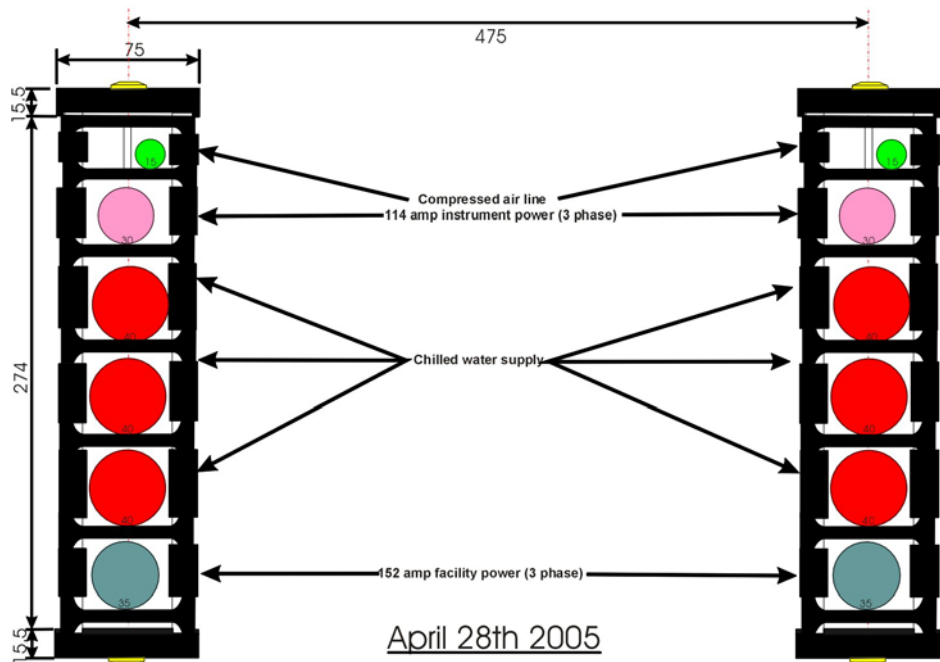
Cable Wrap Layout, Enclosure Side, as of 4/28/05
